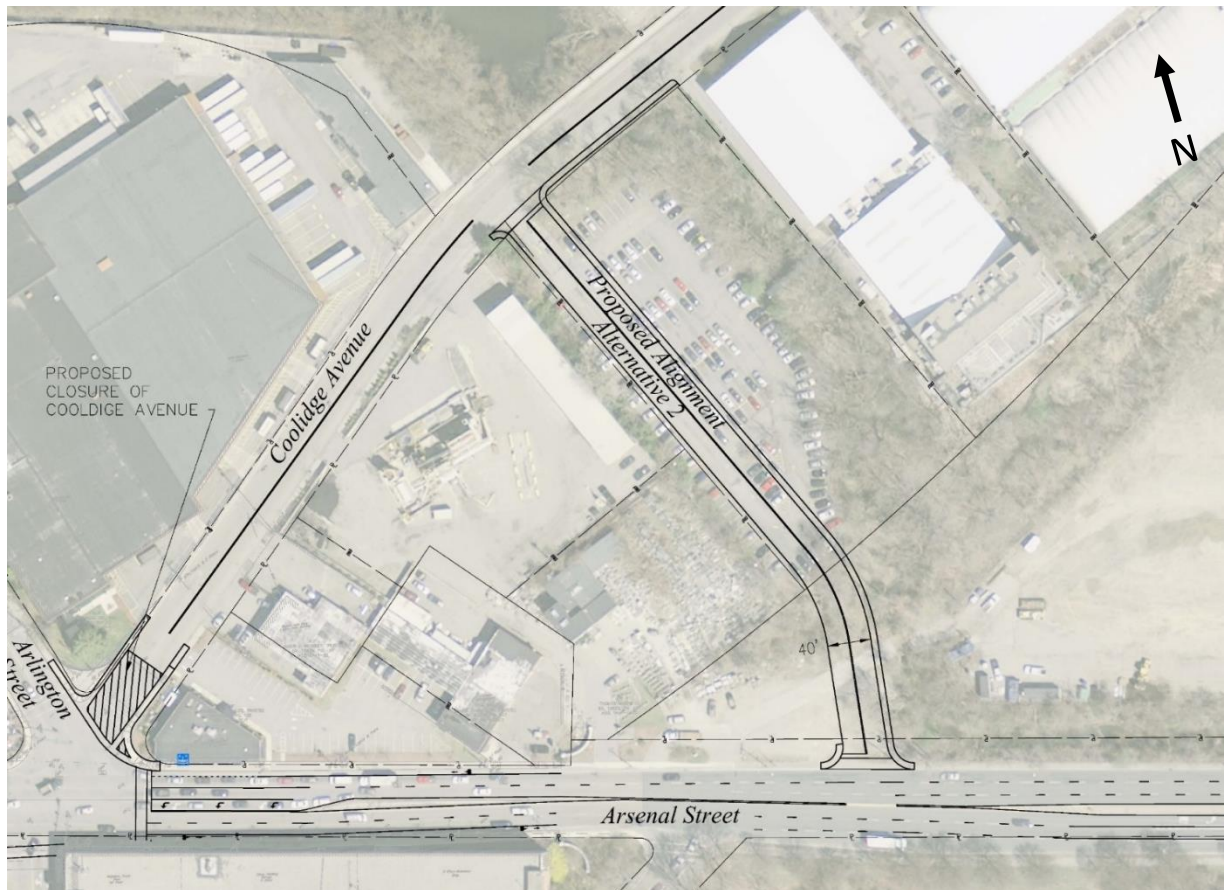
Option 2 Arsenal Street at Arlington Street/Coolidge Avenue Proposed Improvements
